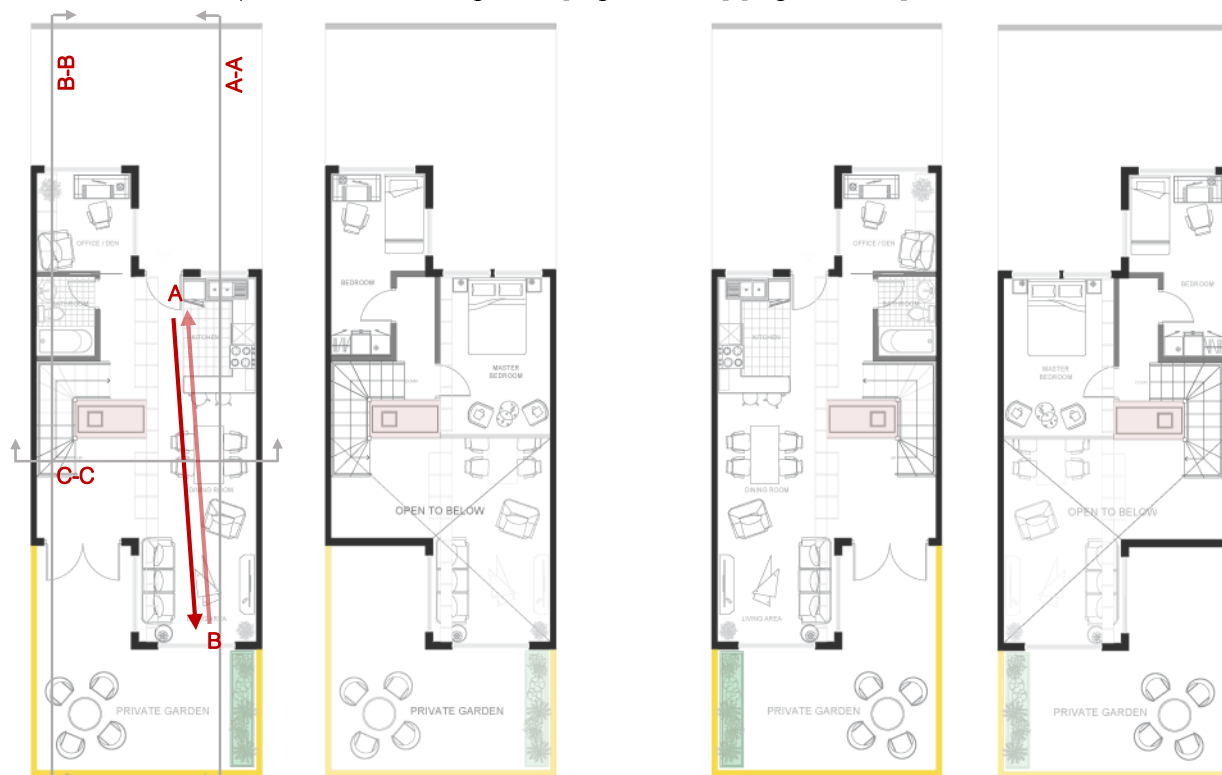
Studio Unit Plans. Ground Floor and Mezzanine Floor respectively.
